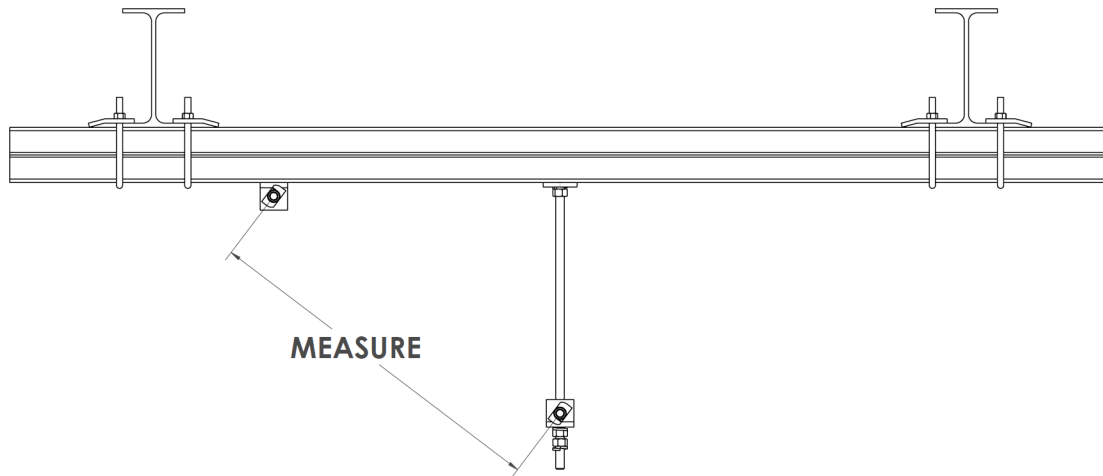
Measure the Length Between the Two-Hole 90° Strut Fitting on the Threaded Rod and the Beam
